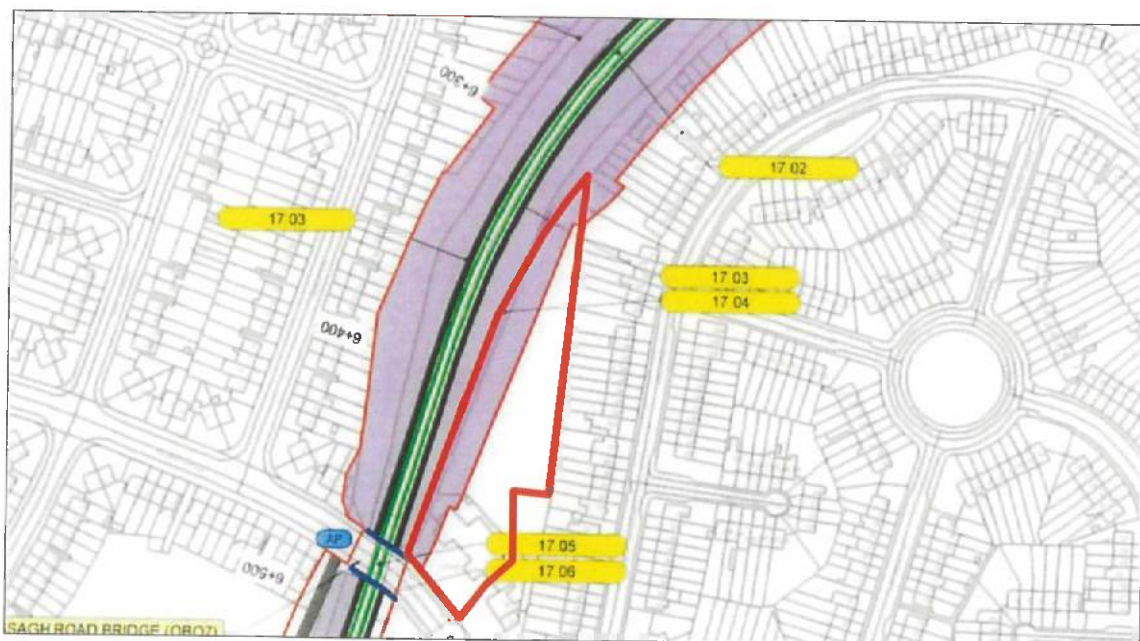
Extract of the works layout plan, with site outlined in red.
